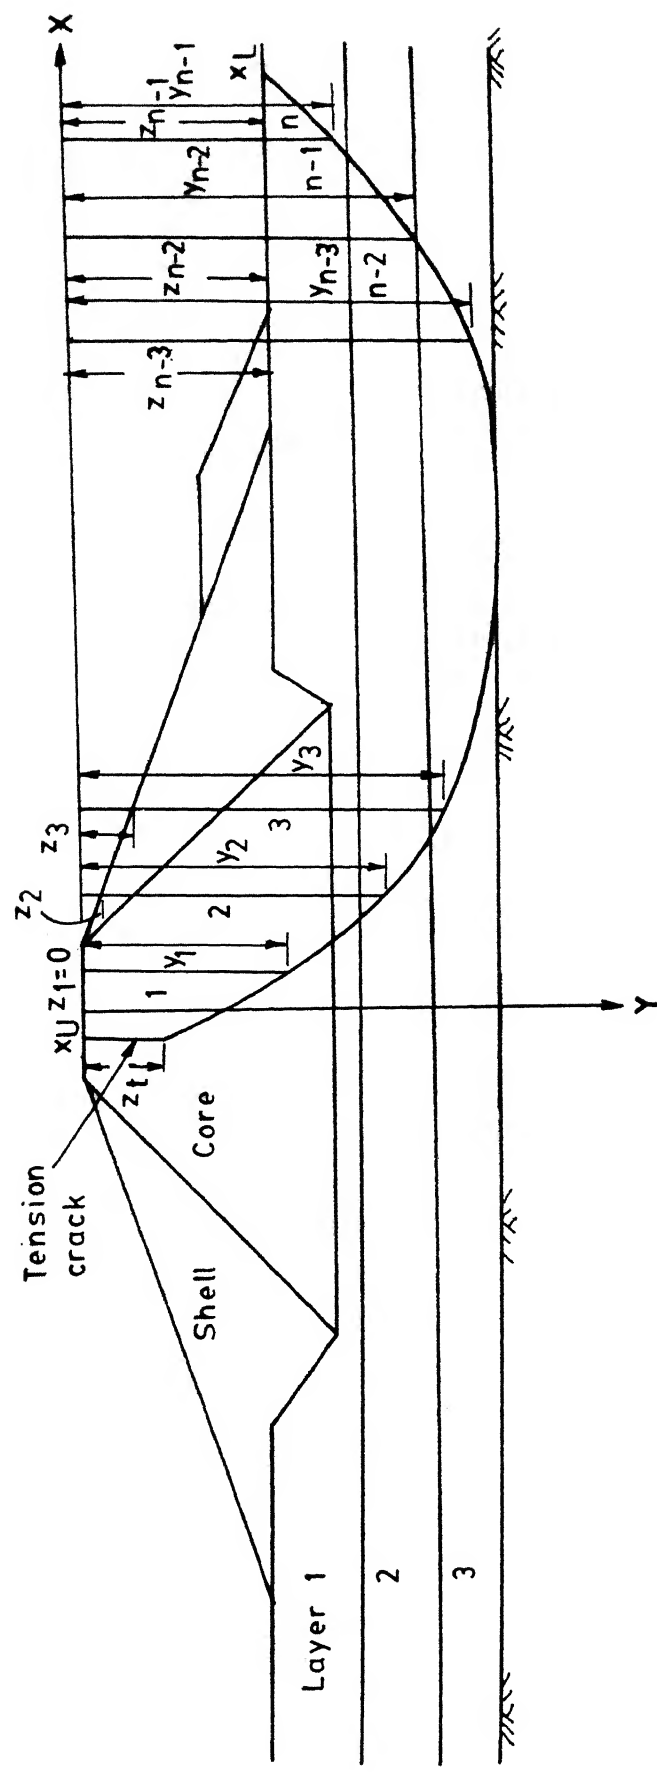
TYPICAL SECTION OF A ZONED DAM WITH A NONCIRCULAR SLIP SURFACE
